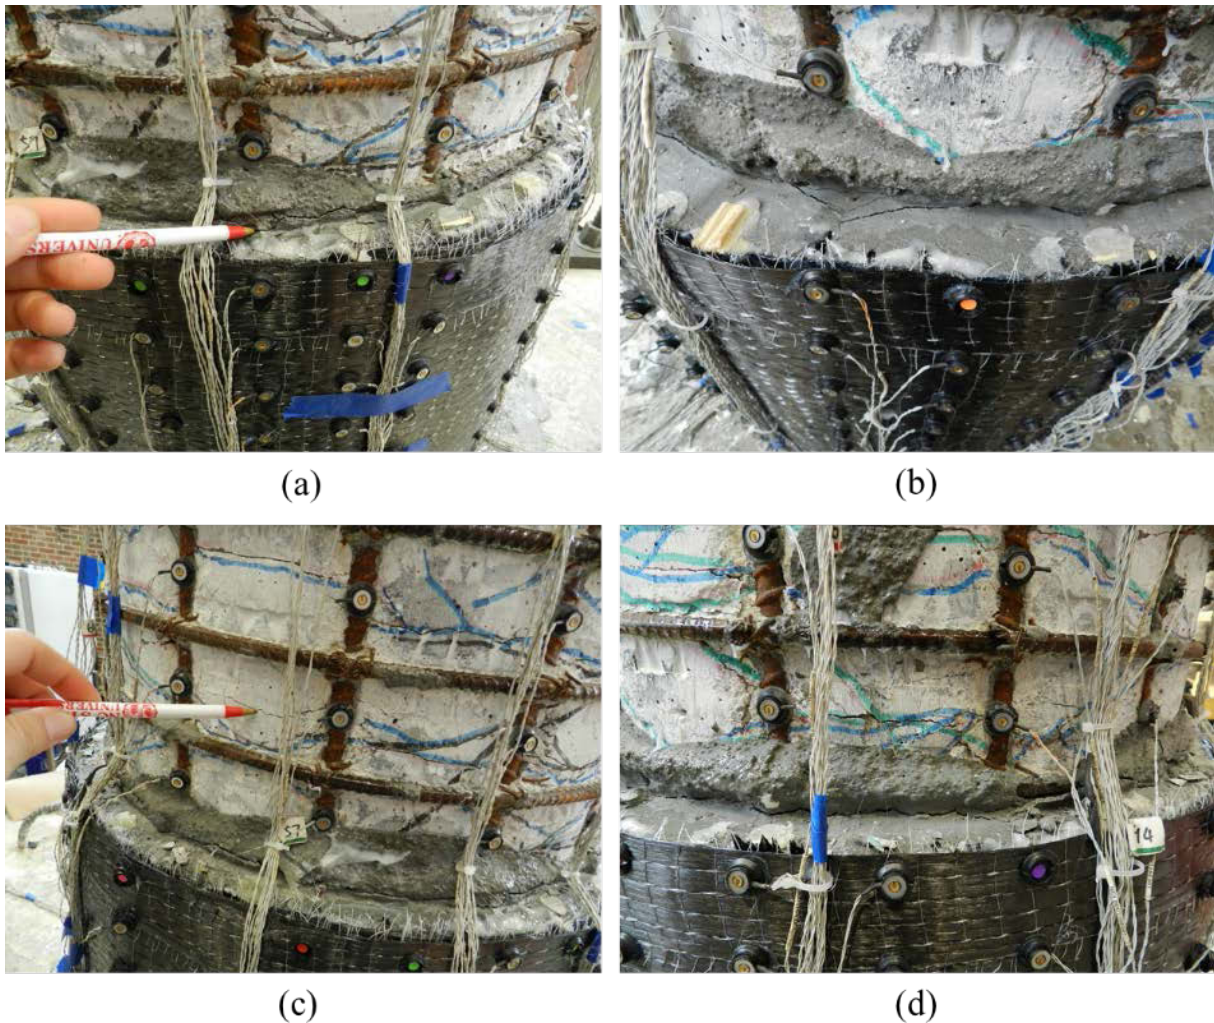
a) Wide Crack in Repair Grout b) Crack Propagation in Repair Grout c) New Hairline Cracks in Core Concrete d) Core Concrete Edge Scaled off
